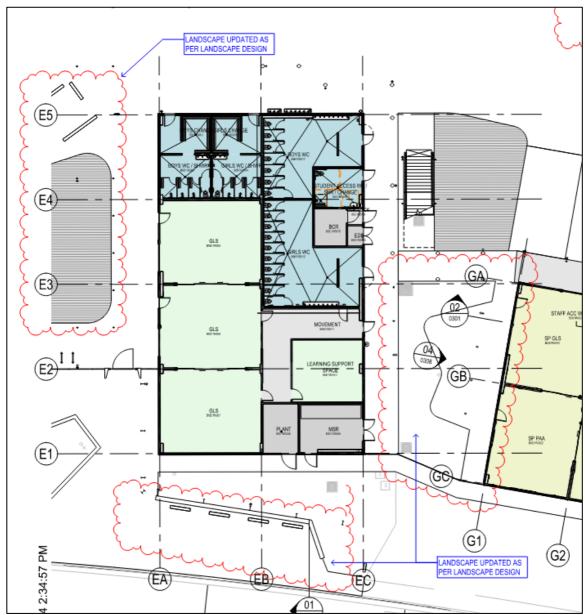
PROPOSED OPEN SPACE AROUND BLOCK E
